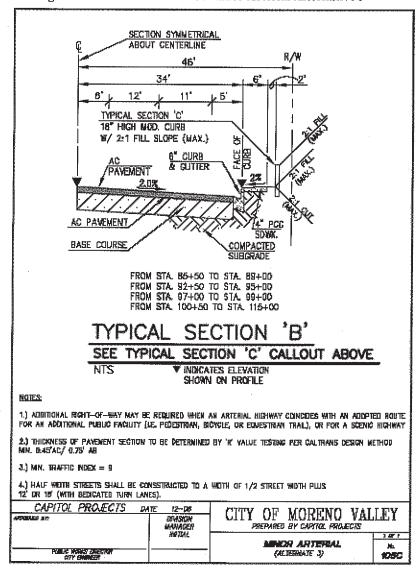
Cross Section 105C: Minor Arterial Alternative 3
